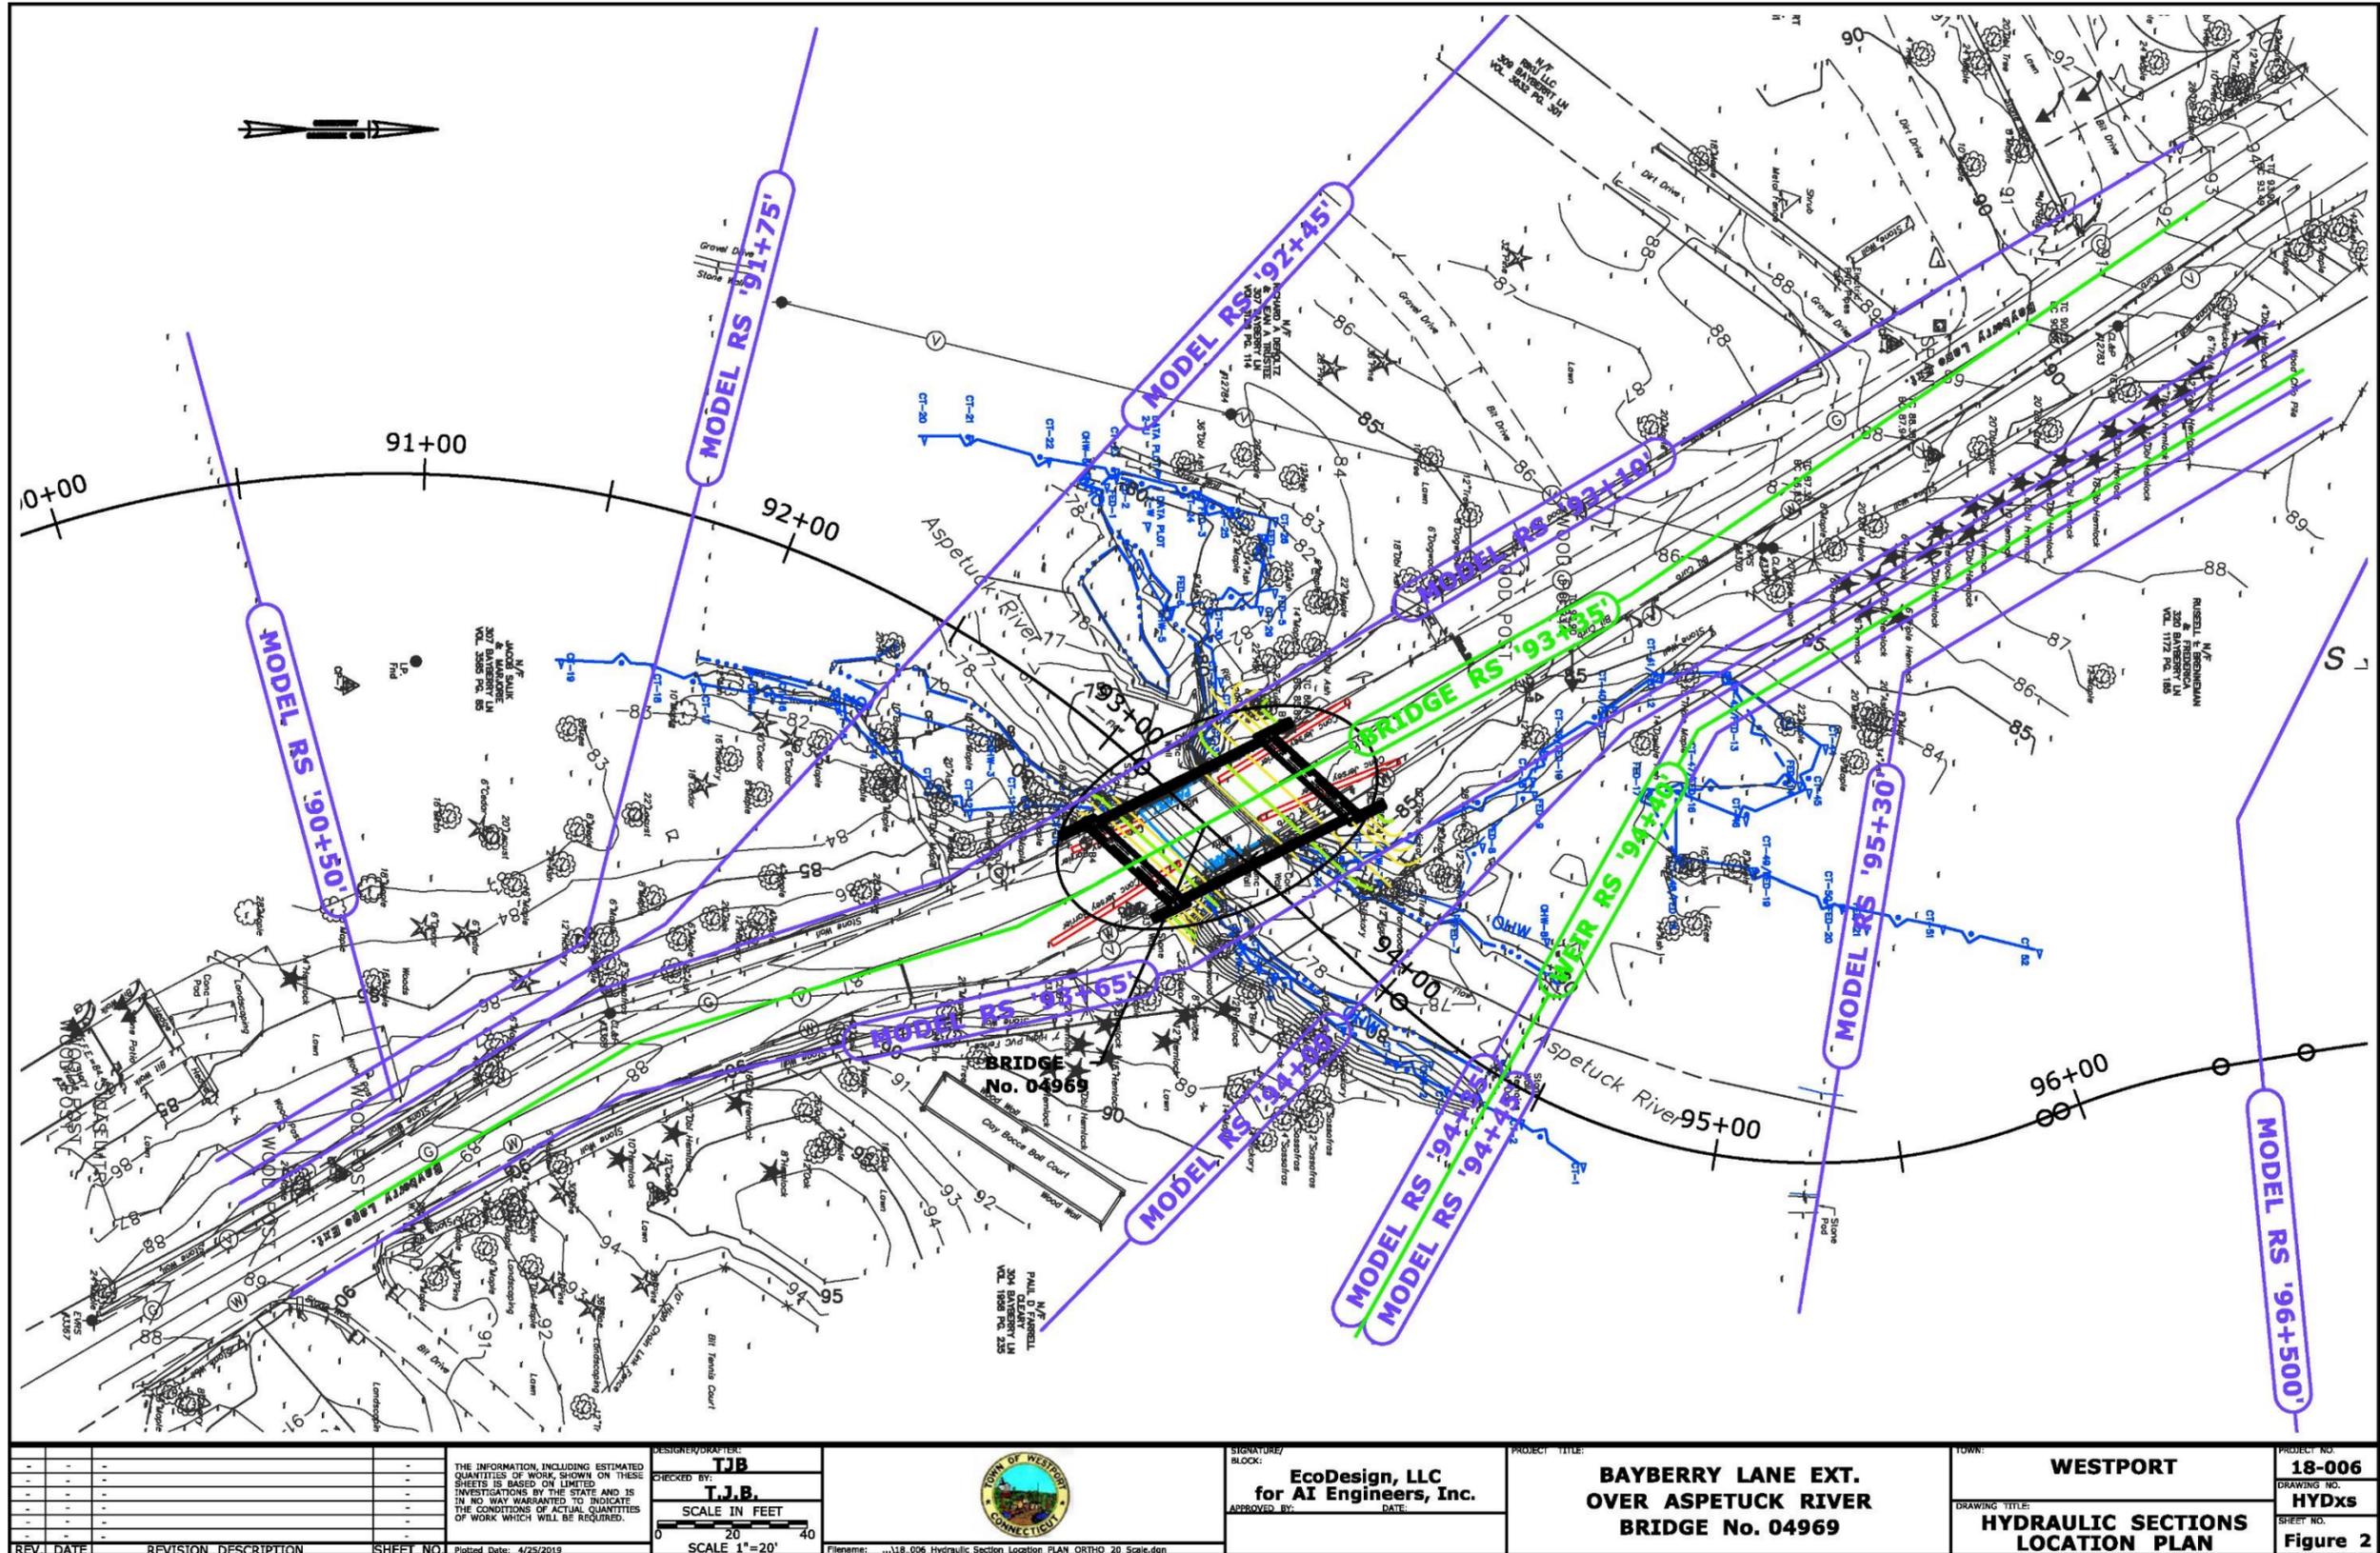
D - CROSS-SECTION LOCATION PLAN 1"=20' - Project Survey
